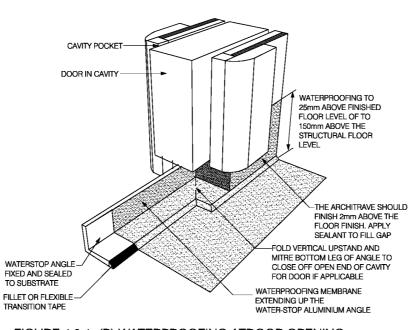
(B) WATERPROOFING ATDOOR OPENING CAVITY SLIDER
